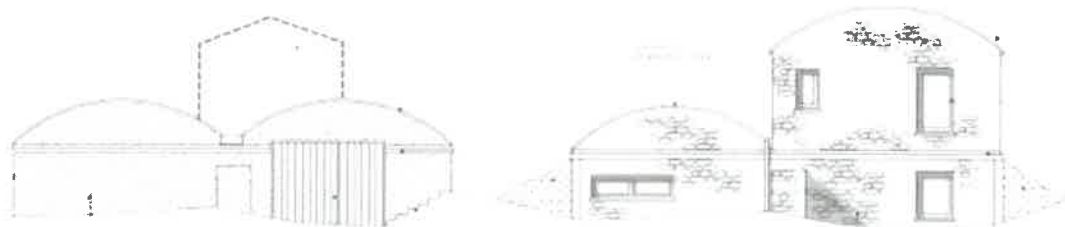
comparison existing and proposed east elevations showing outline of building for removal (dashed line)
